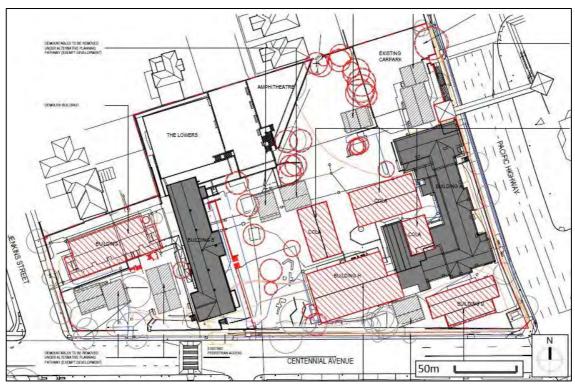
| CPS existing site plan with buildings to be demolished shaded red (Base source: RtS 2020)
